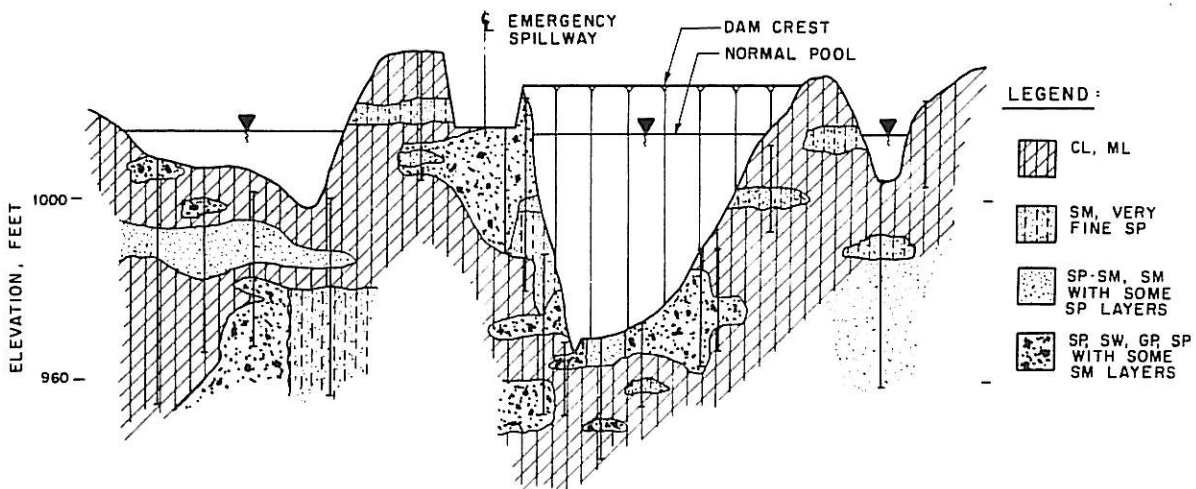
Subsurface Profile Beneath Dam (Section A-A', Figure 3)
